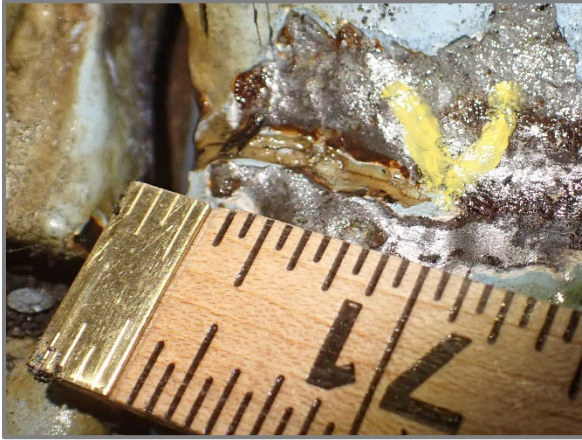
Floorbeam 9 in Span 2 top 1" long crack in the rear top web cope at the Left Truss after grinding and magnetic particle testing.
